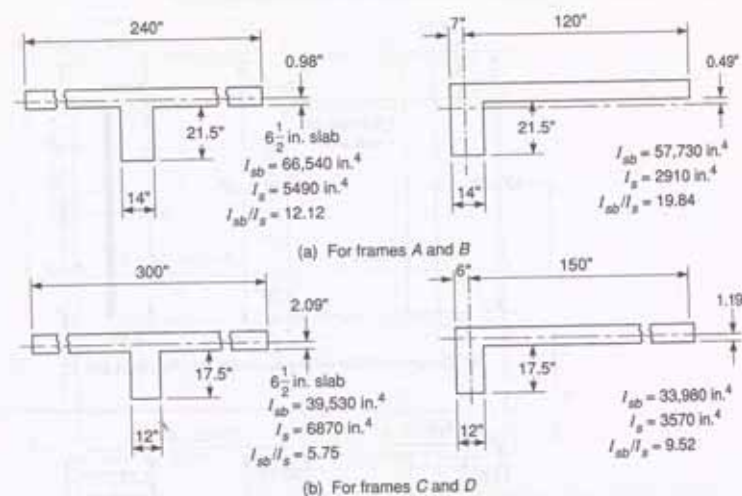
Slab-beam cross-sections in two-way slab (with beams) design example.
